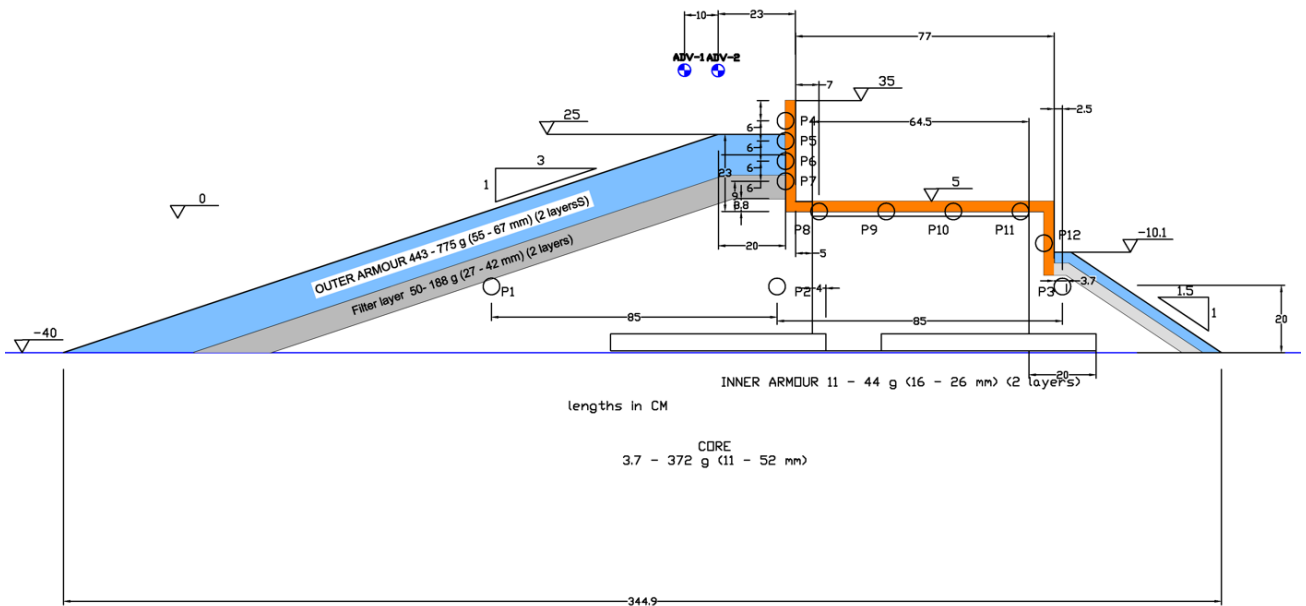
Rubble-mound breakwater with crown-wall (type I) transversal section
